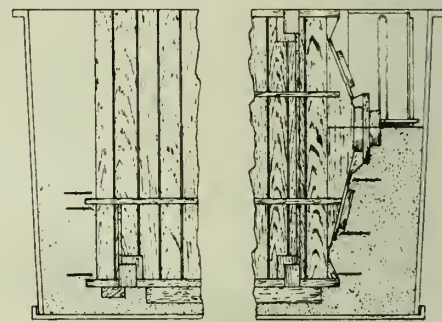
PART KENT SPECIAL CONSTRUCTION. DRAWBACK PLATE AND RIBS AND AS SHOWN IN DRAWING.
